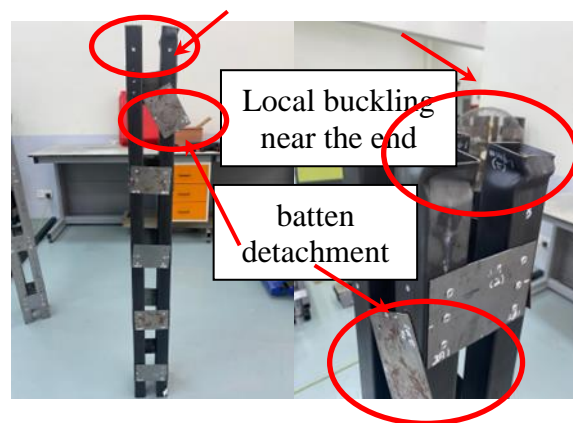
Failure modes for specimen CFS built-up batted column with SHS of S3-H2-B300
